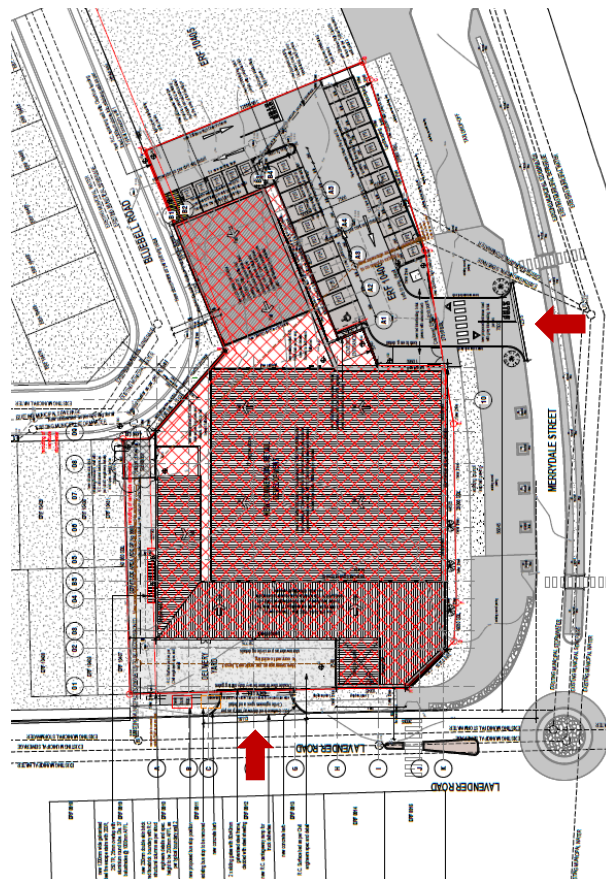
Approved Vehicular Access for Erf 10405 (Source: MWP Architects Building Plan Application)
